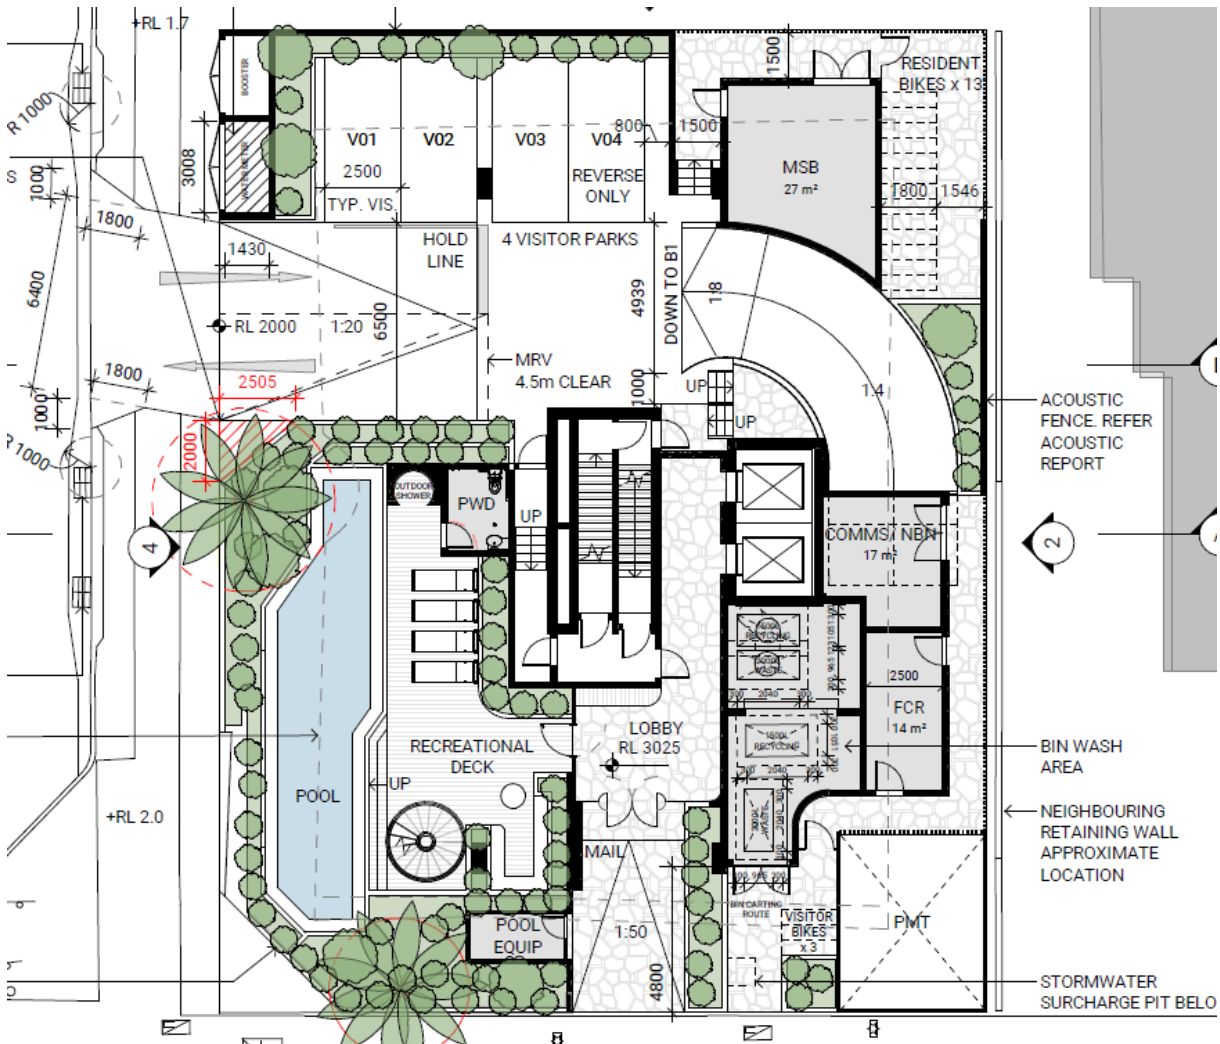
Proposed Ground Floor Plan (Source: Plus Architecture)
